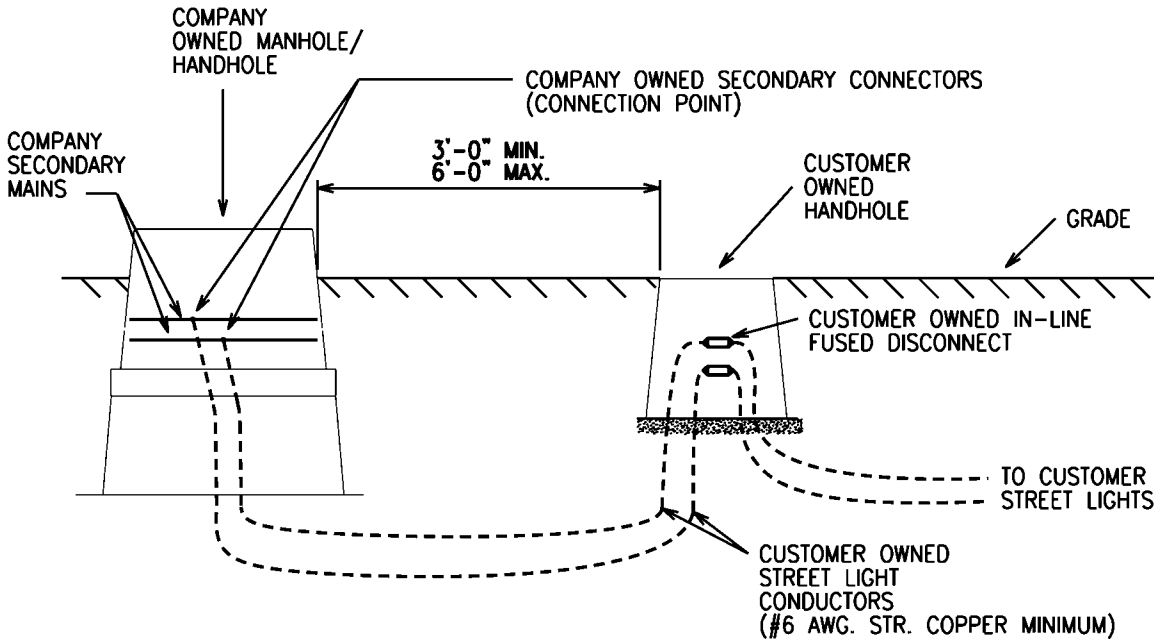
Connection of Underground Supplied Customer Owned Street Light to National Grid Handhole or Manhole – Standard Connection
